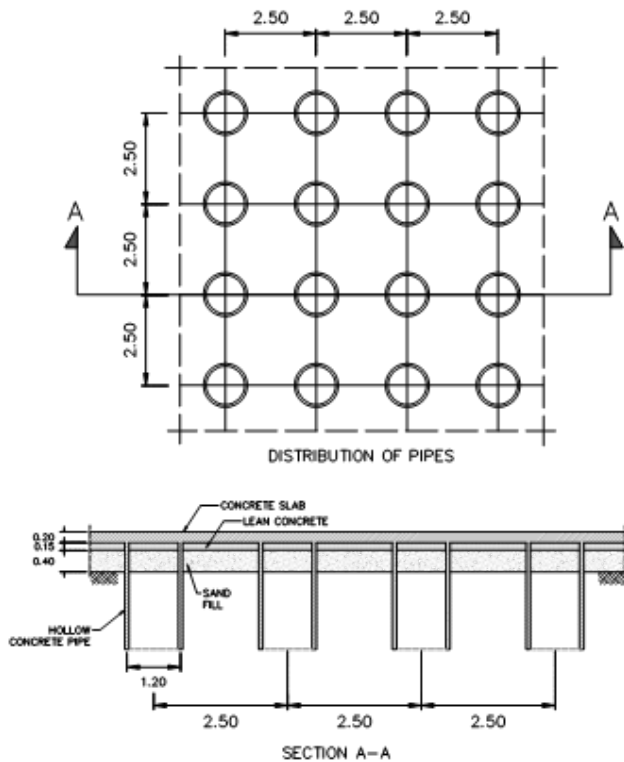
Cross-section drawing of Cakar Ayam pavement system (reproduced from Suhendro (2018))
